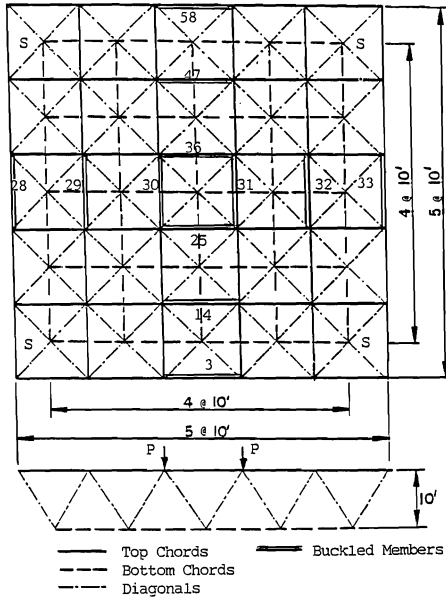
Geometry, loading, and member failures for truss T4
